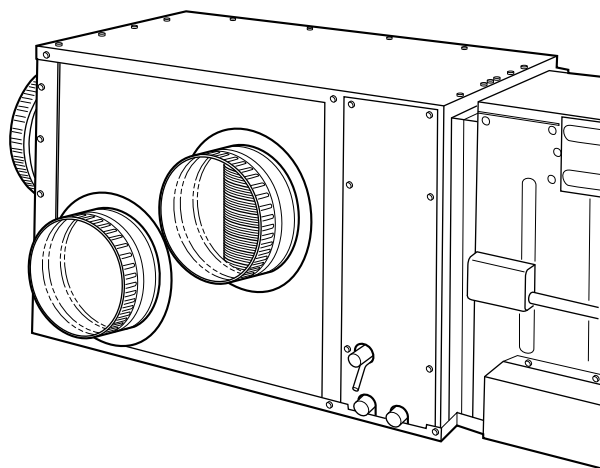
CD3C Horizontal Evaporator Coil Installation
